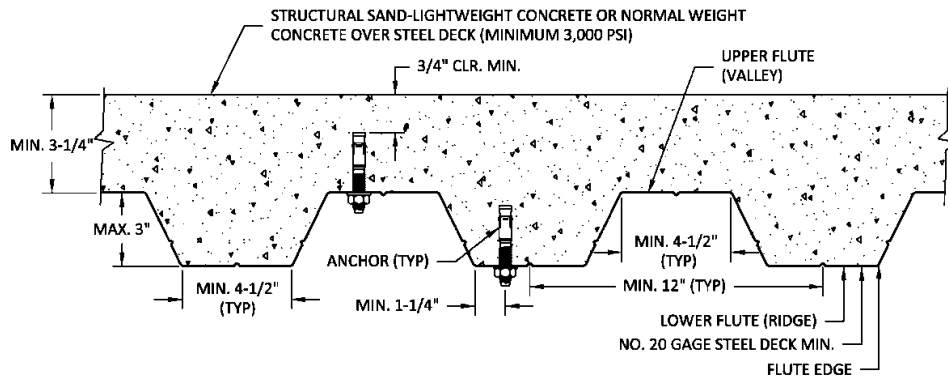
A—POWER-STUD+ SD2 INSTALLATION DETAIL FOR ANCHORS IN THE SOFFIT OF CONCRETE OVER STEEL DECK FLOOR AND ROOF ASSEMBLIES (SEE DIMENSIONAL PROFILE REQUIREMENTS)<sup>1</sup>
